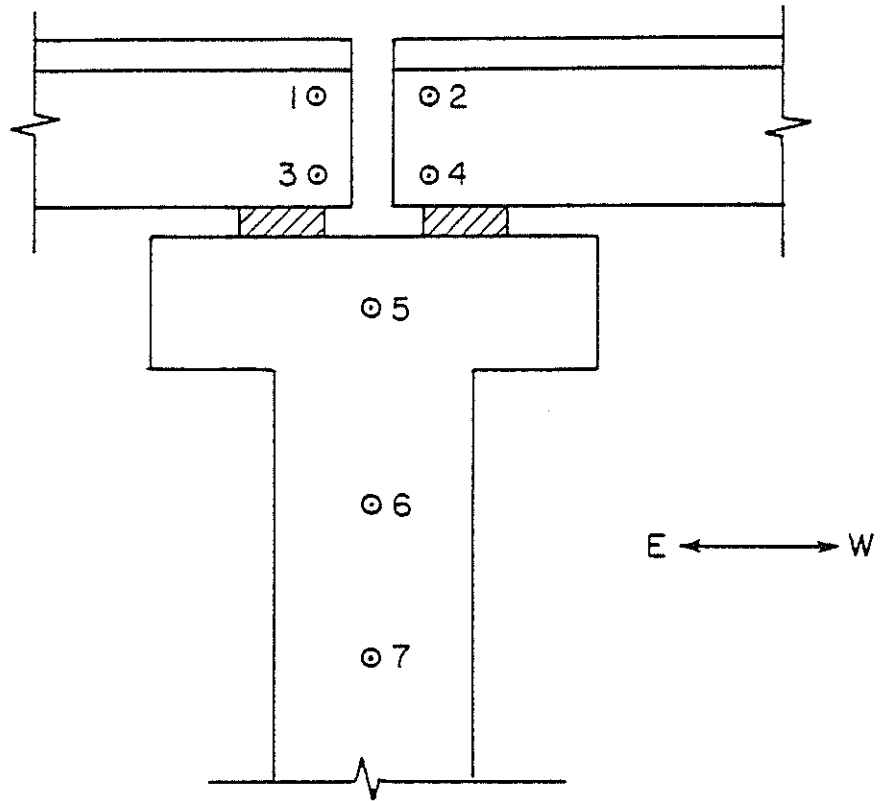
Marker Placement on a Typical Bent Supporting an Expansion Joint.
